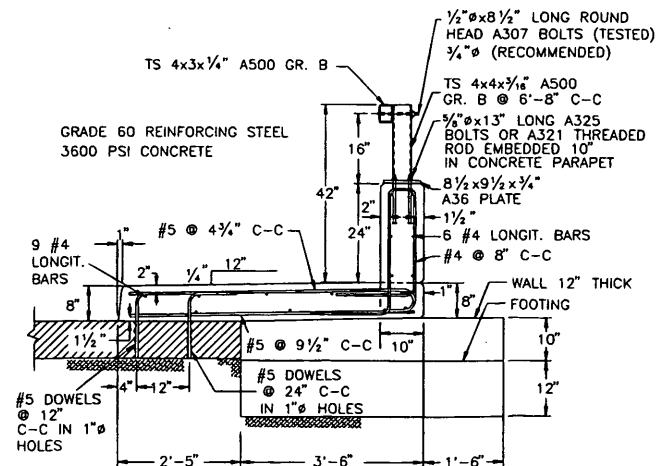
Cross section of BR27C mounted on sidewalk.
